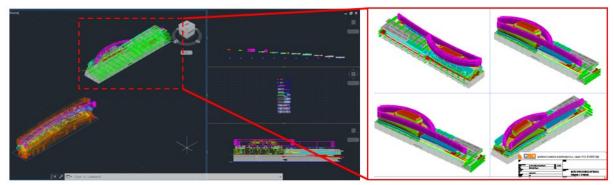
Building elements placed in containers. Project for Slovenian Pavilion from Riko d.o.o.
